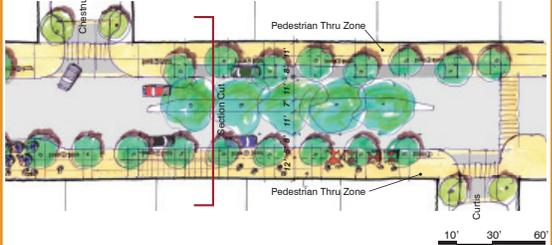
Concept Plan of Santa Cruz Avenue with Major Streetscape Improvements. This plan does not feature the Central Plaza described in the next section.
